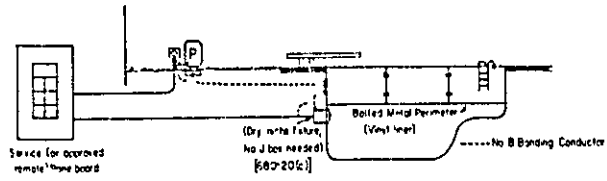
Illustrated is a metal (i.e., steel, aluminum) perimeter pool with bonded (may be welded) sections. The metal perimeter serves as the common bonding grid to which the metal ladder, the metal diving board, the dry niche fixture, and pump motor are connected. Note that the pump motor is connected to a receptacle as per Sections 680-6 and 680-7.
